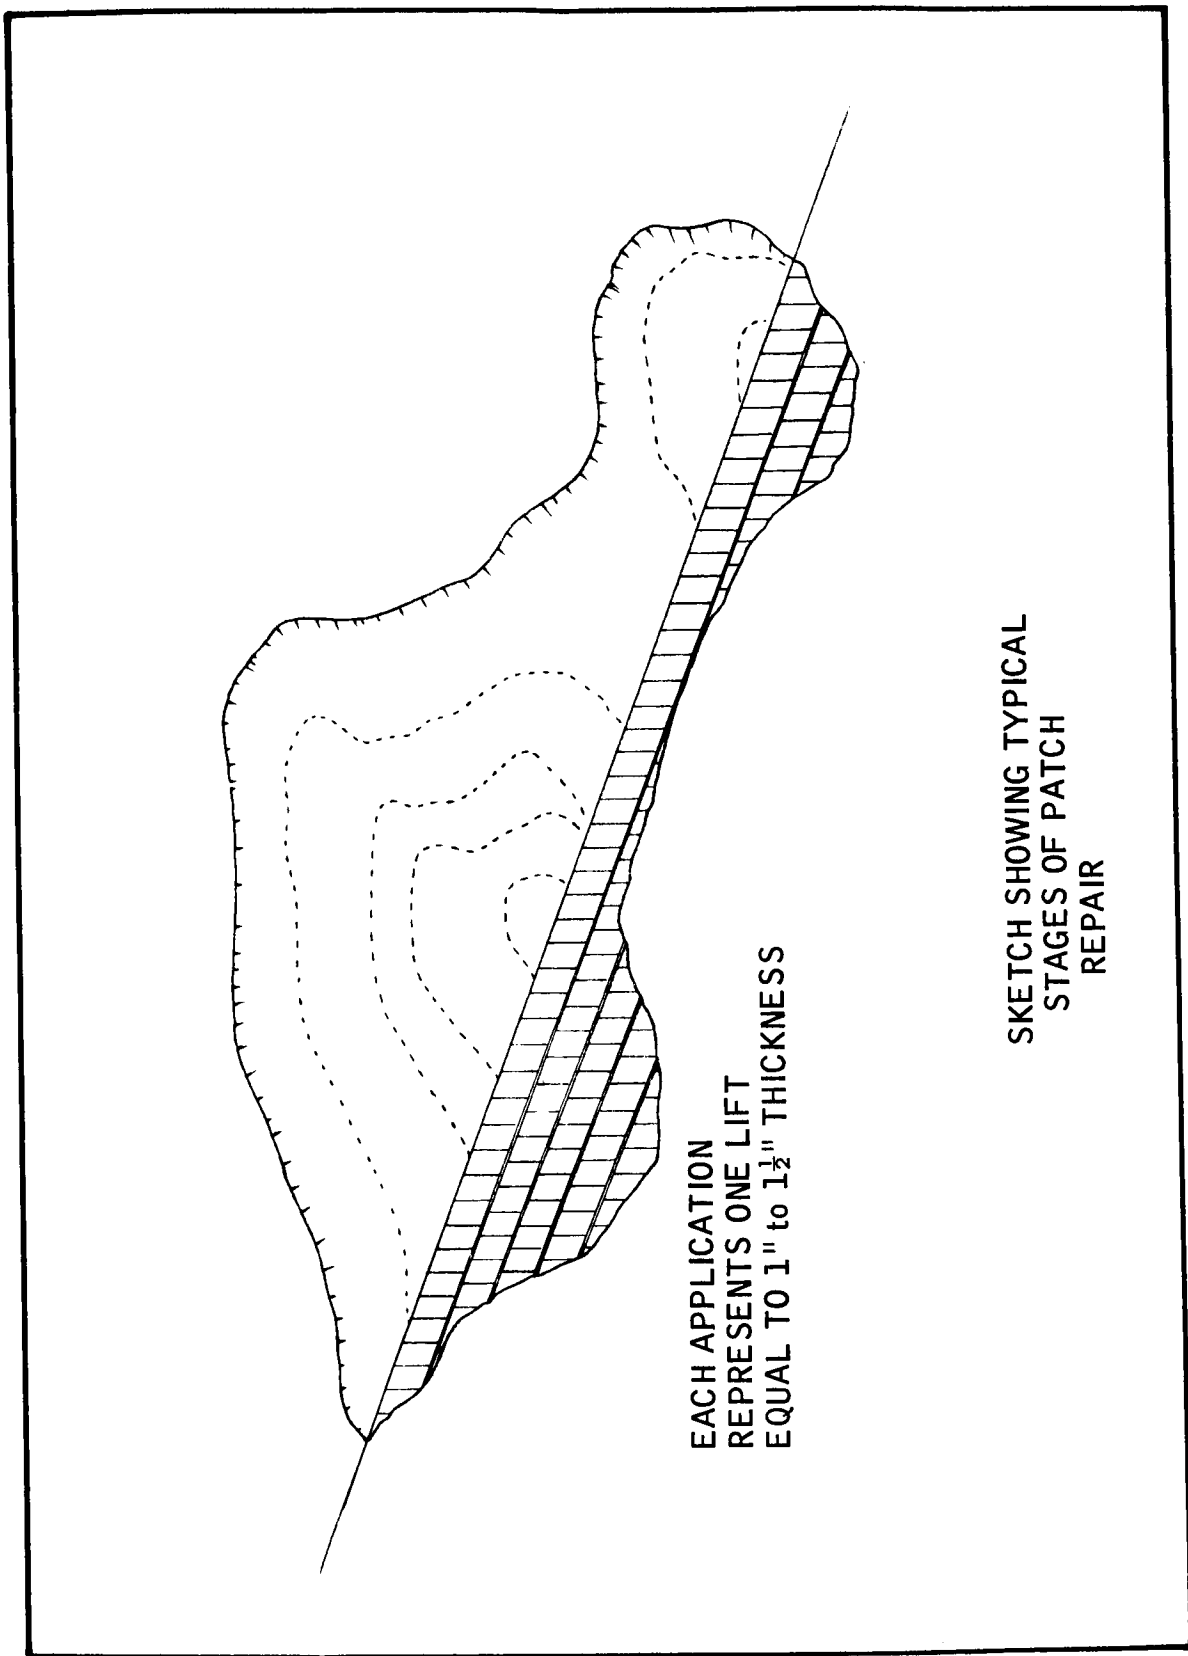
Sketch Showing Typical Stages of Patch Repair
